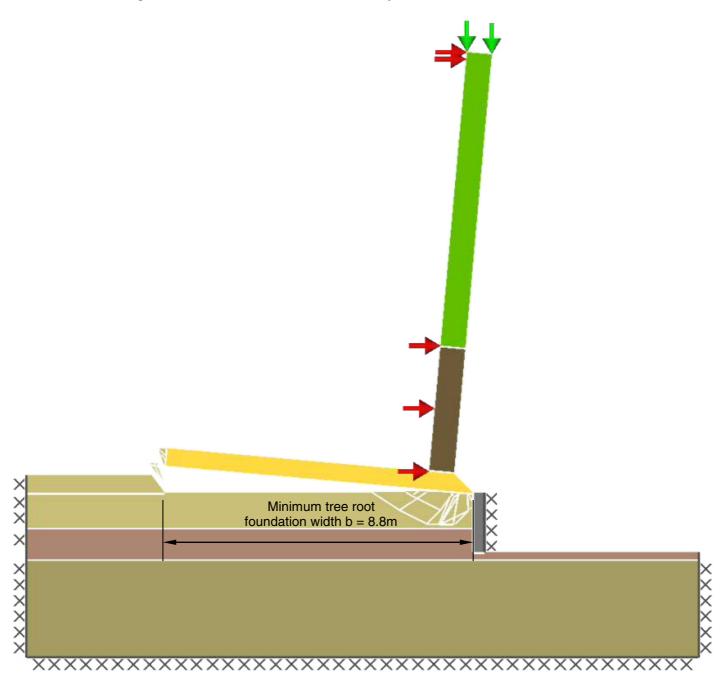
Tree root foundation stability failure mode – Critical case DA1-1
